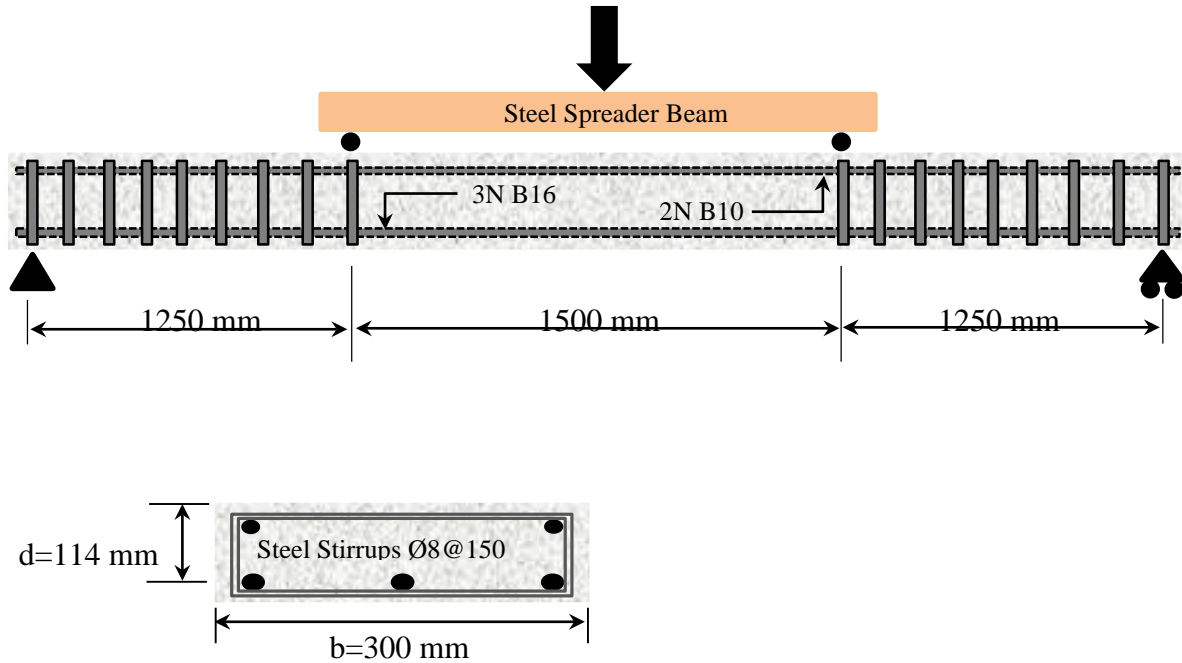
Structural details of the 4200mm beams tested under 4-point loading
